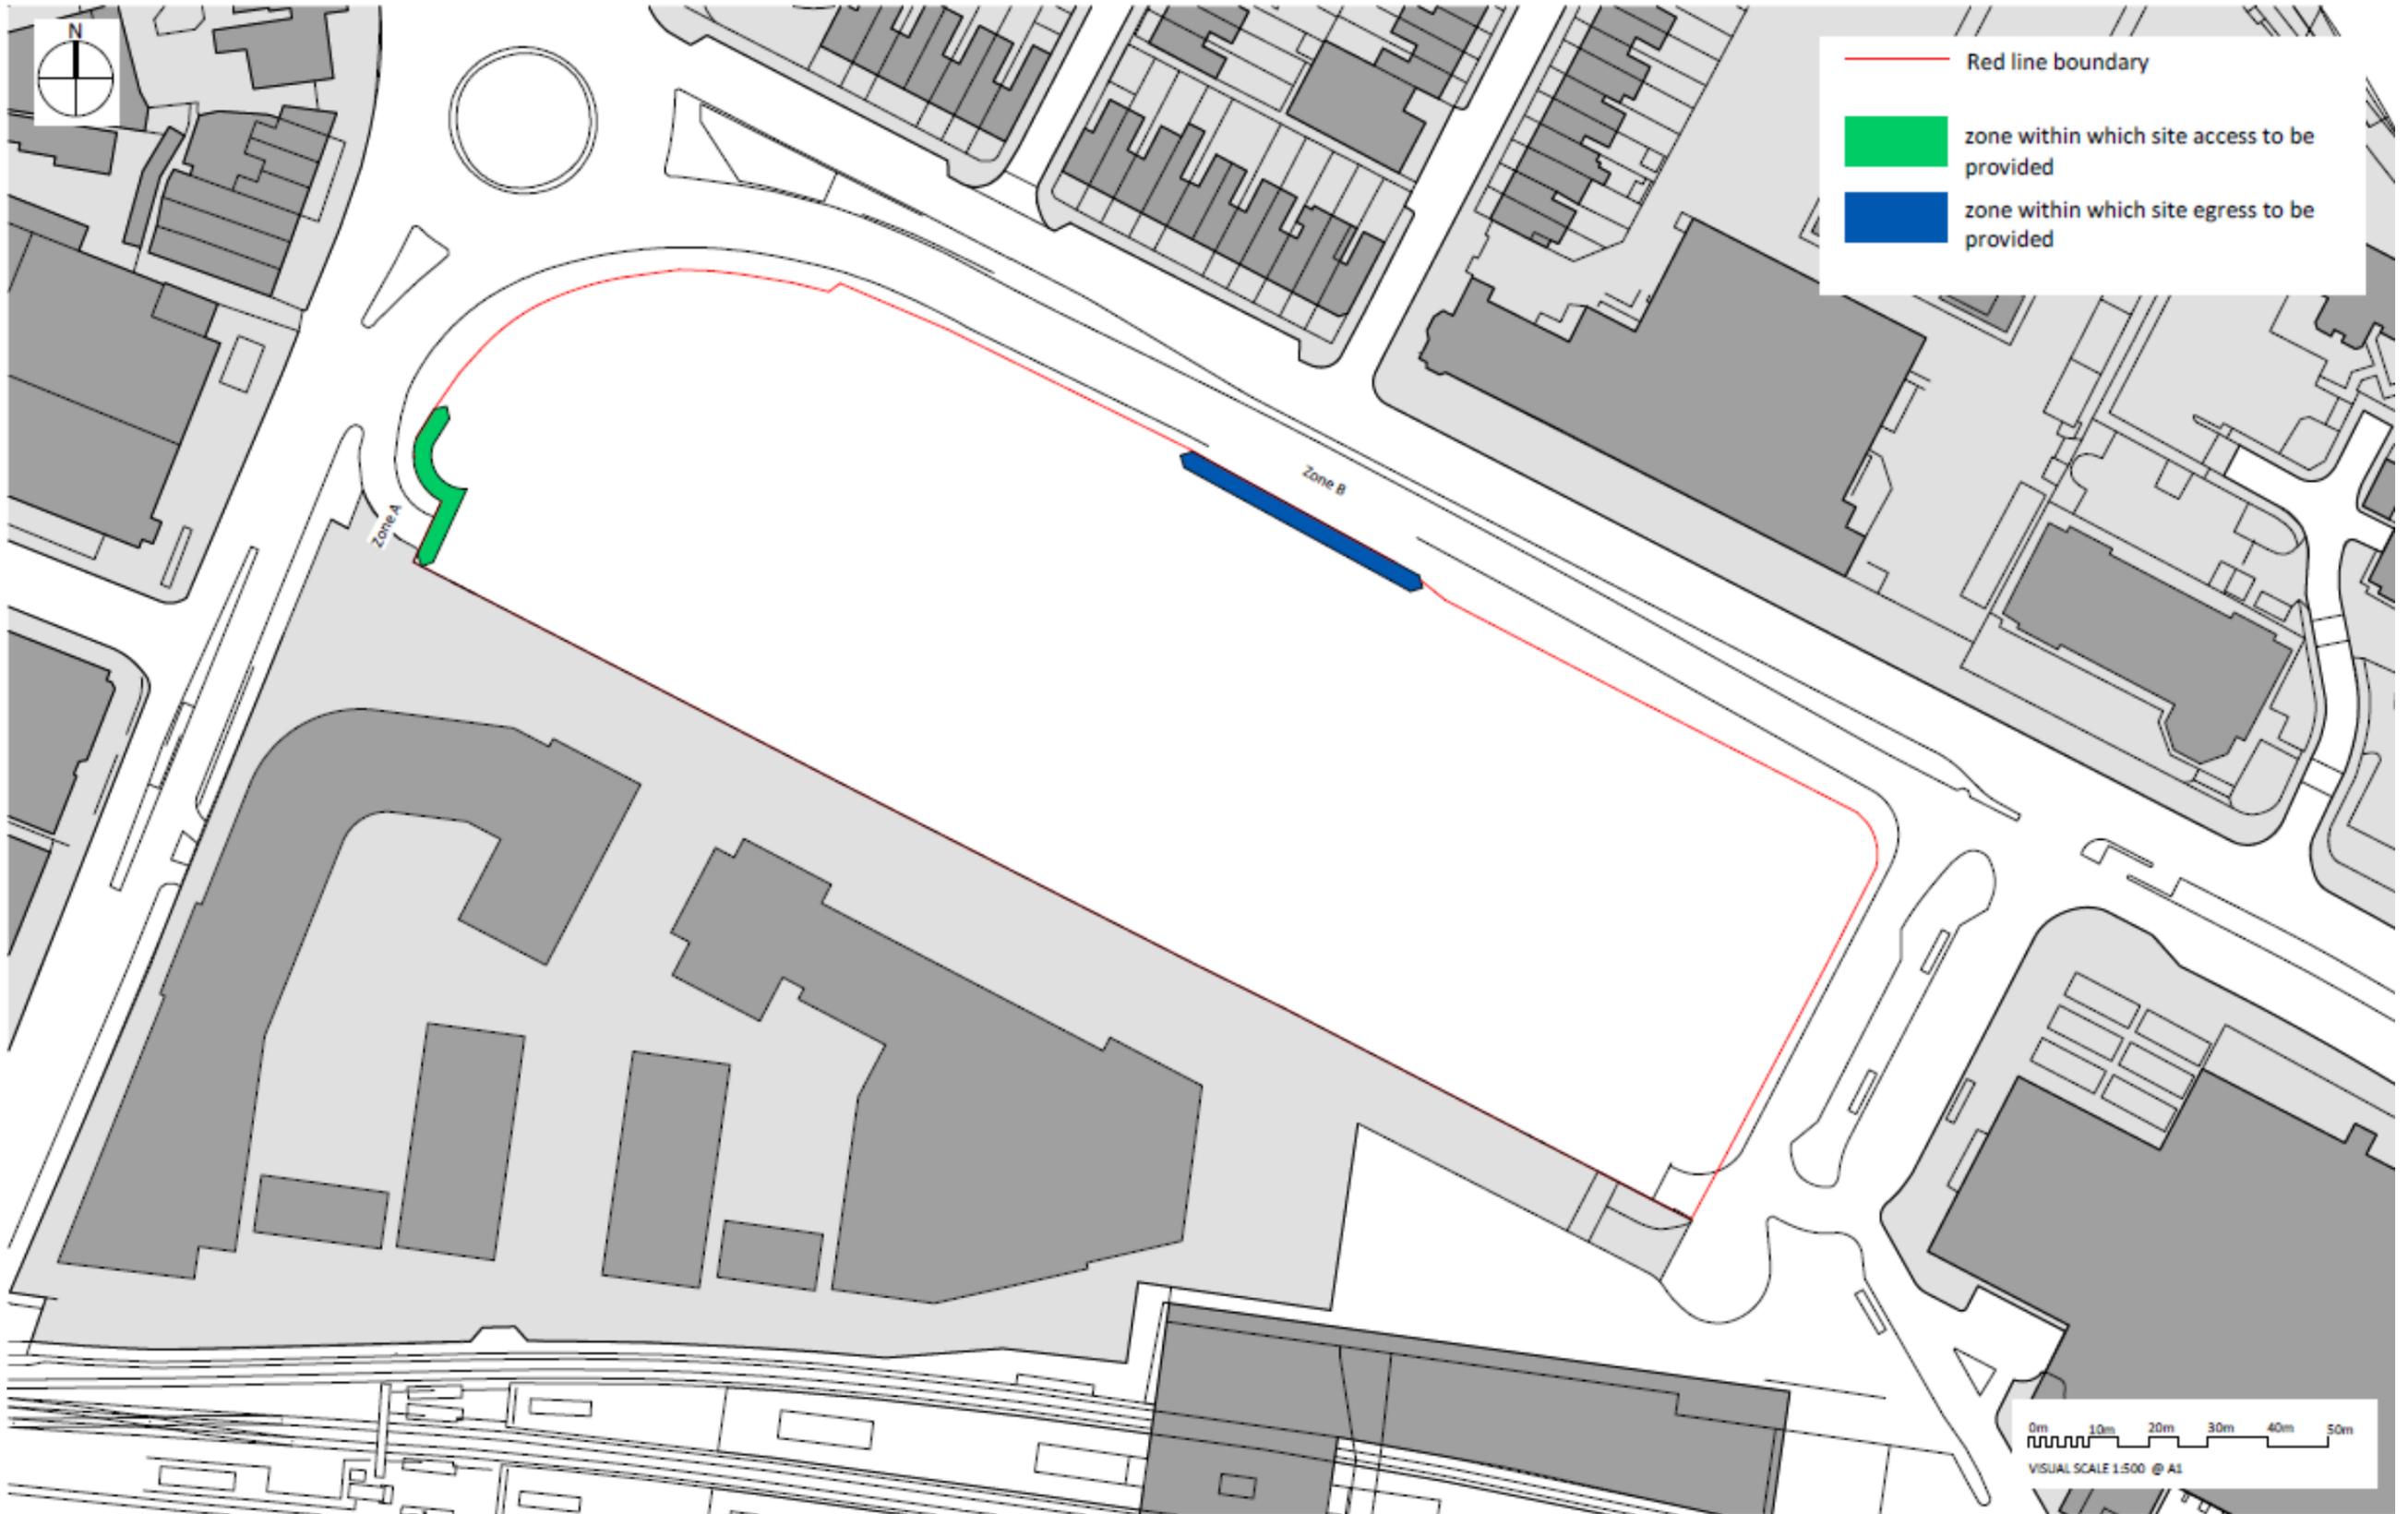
Parameter Plan 101 - Proposed Site Access and Egress
